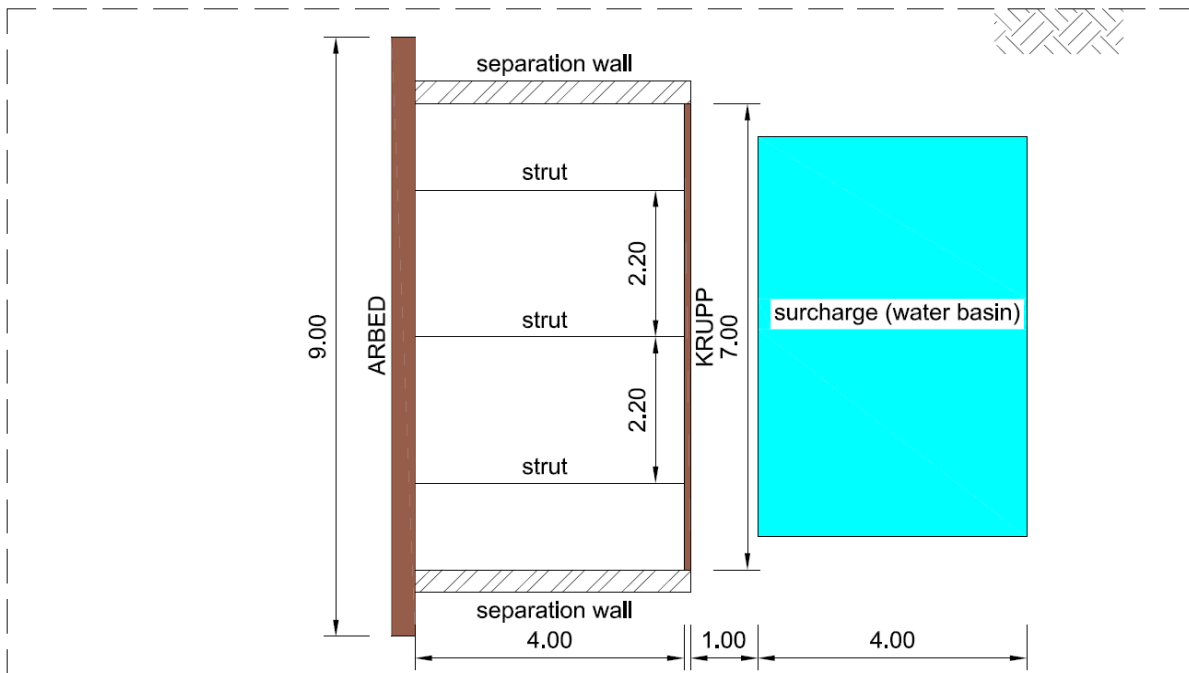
Karlsruhe braced sheetpile excavation: top view.
